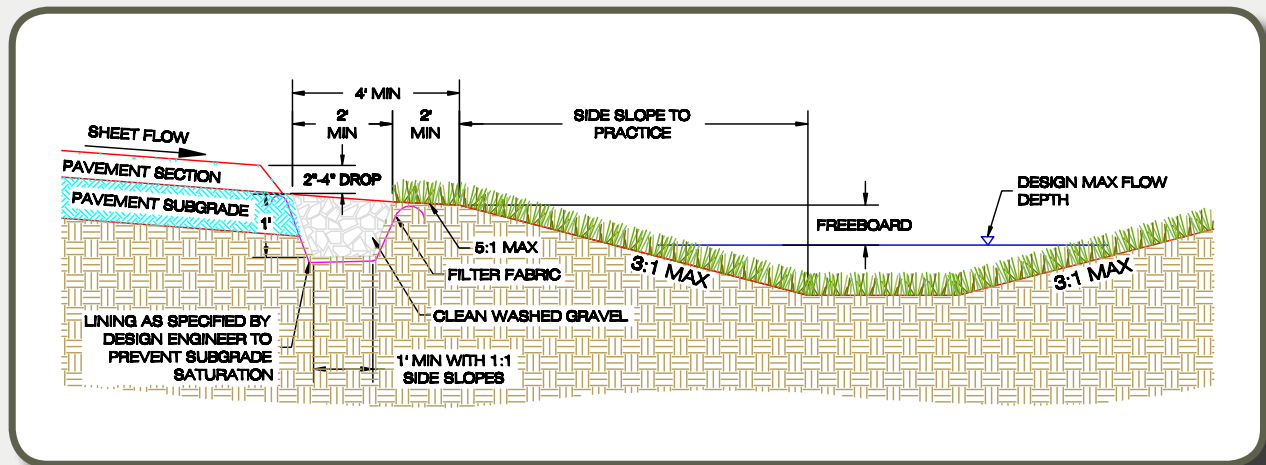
Typical Detail for Pre-Treatment at Pavement Edge – A 2 to 4 inch drop from the pavement to the top of stone helps to prevent clogging.
